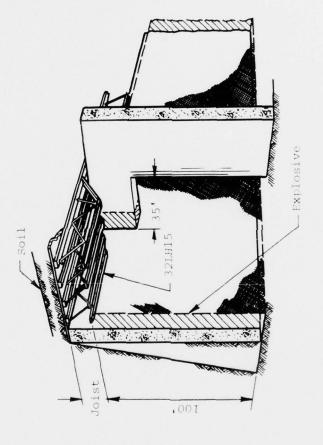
Long-Span Steel Joists - 250-Foot Span (Continued)
